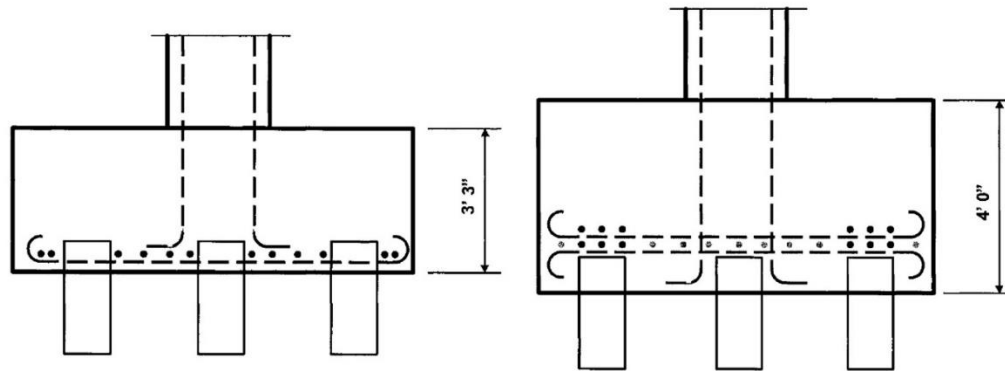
Drilled shaft footing designed by sectional design method (left) and STM (right) (Klein, 2002)
